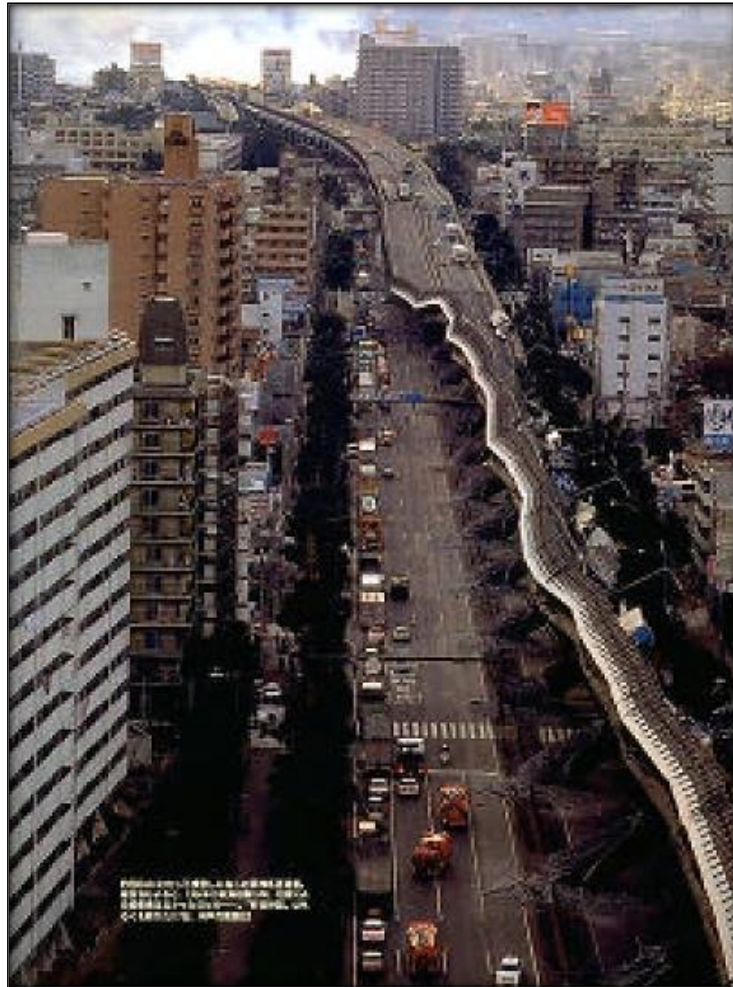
Collapsed Section of Hanshin Expressway, (U.C. Berkeley, 1995)
